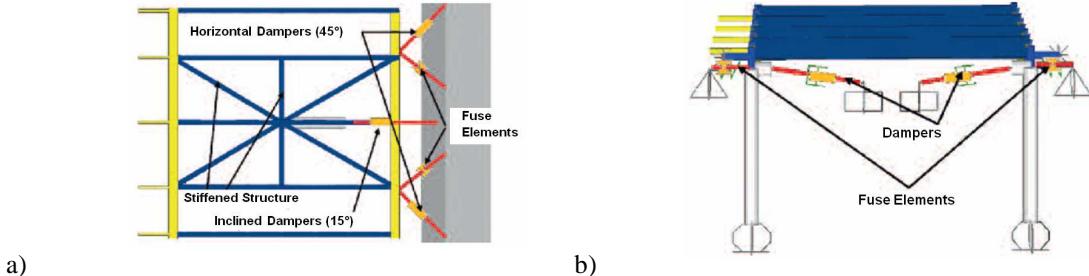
Nonlinear Viscous dampers arrangement at main Piers (a) – and Temporary Piers (b).
